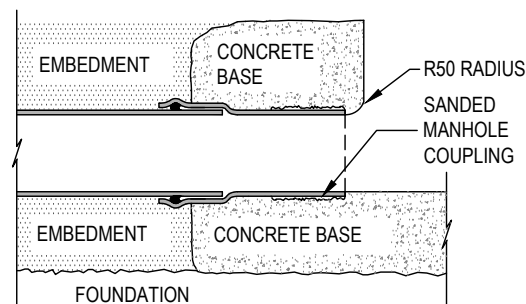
D: PVC PIPE CONNECTION (SECTION VIEW)
